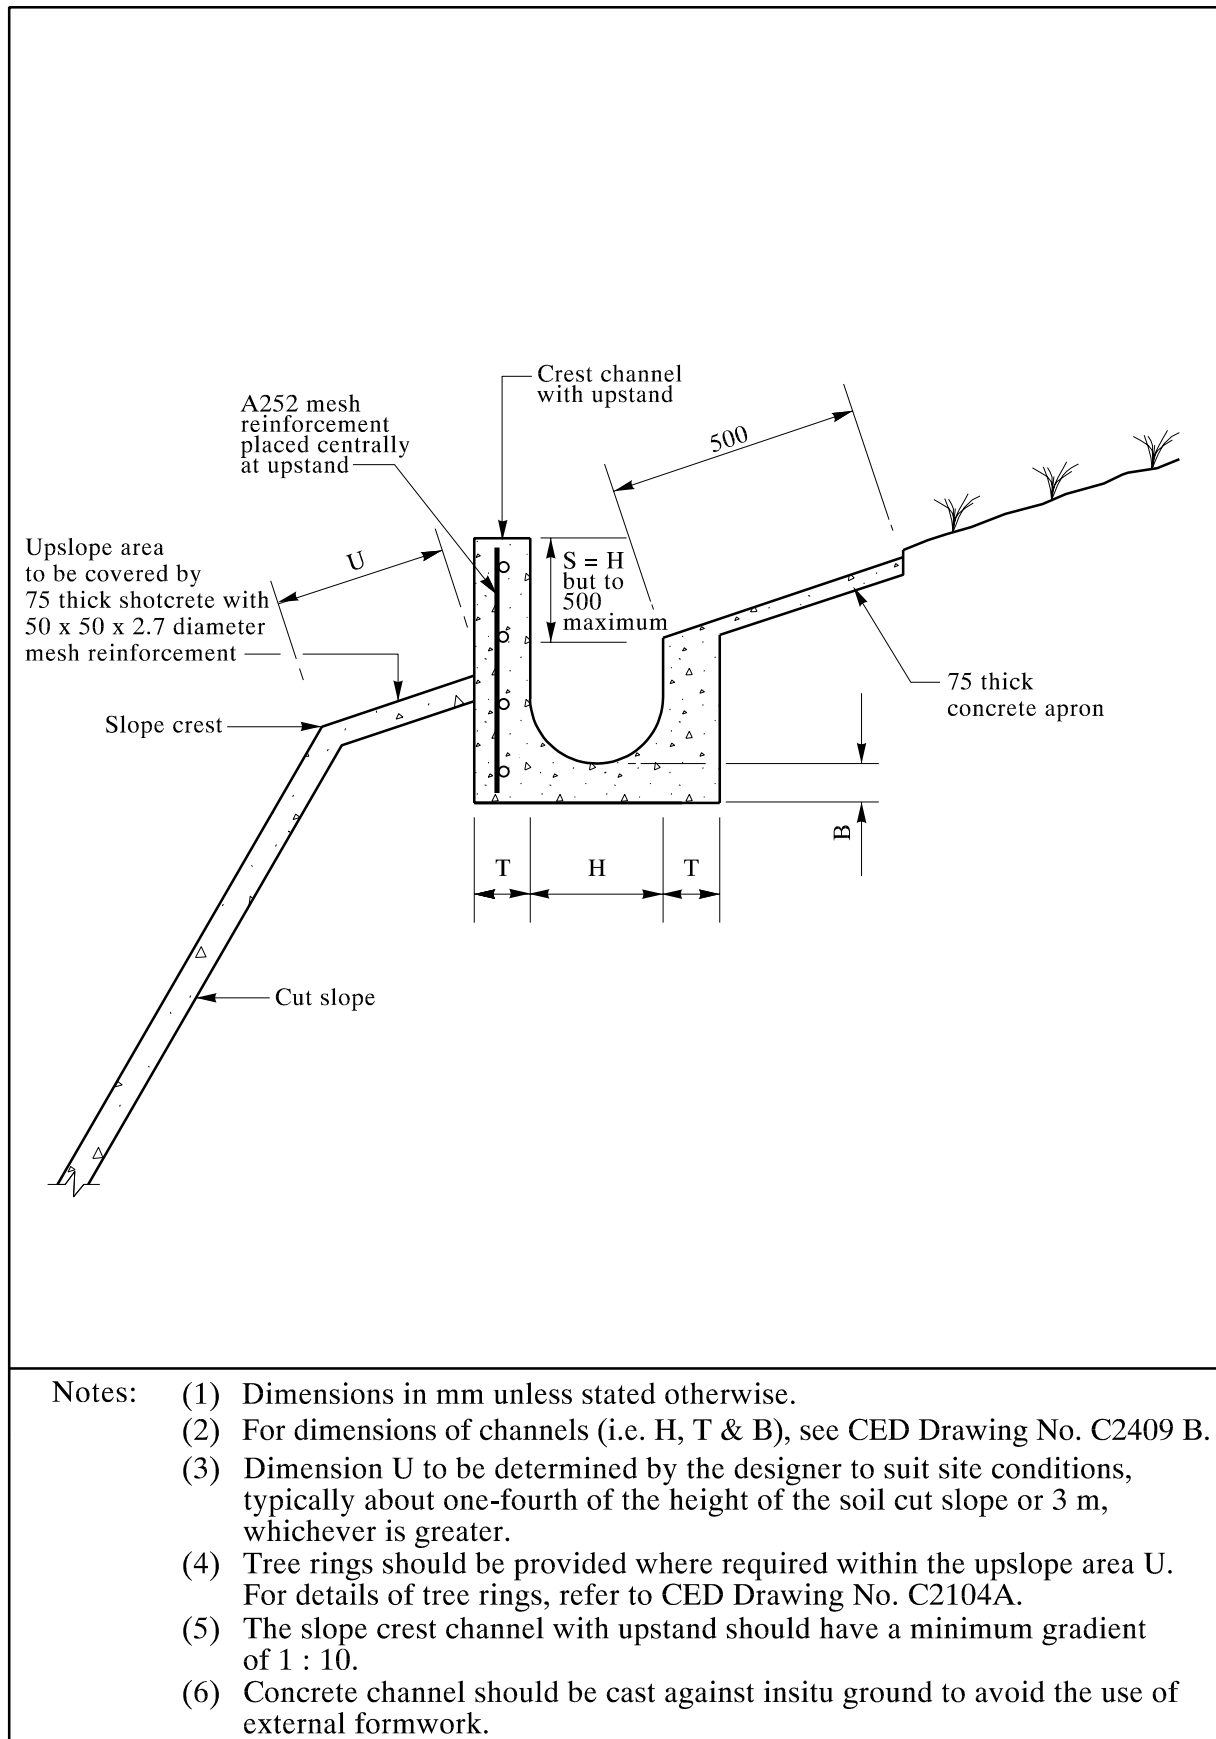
Shotcrete to Upslope Area and Crest Channel with Upstand
